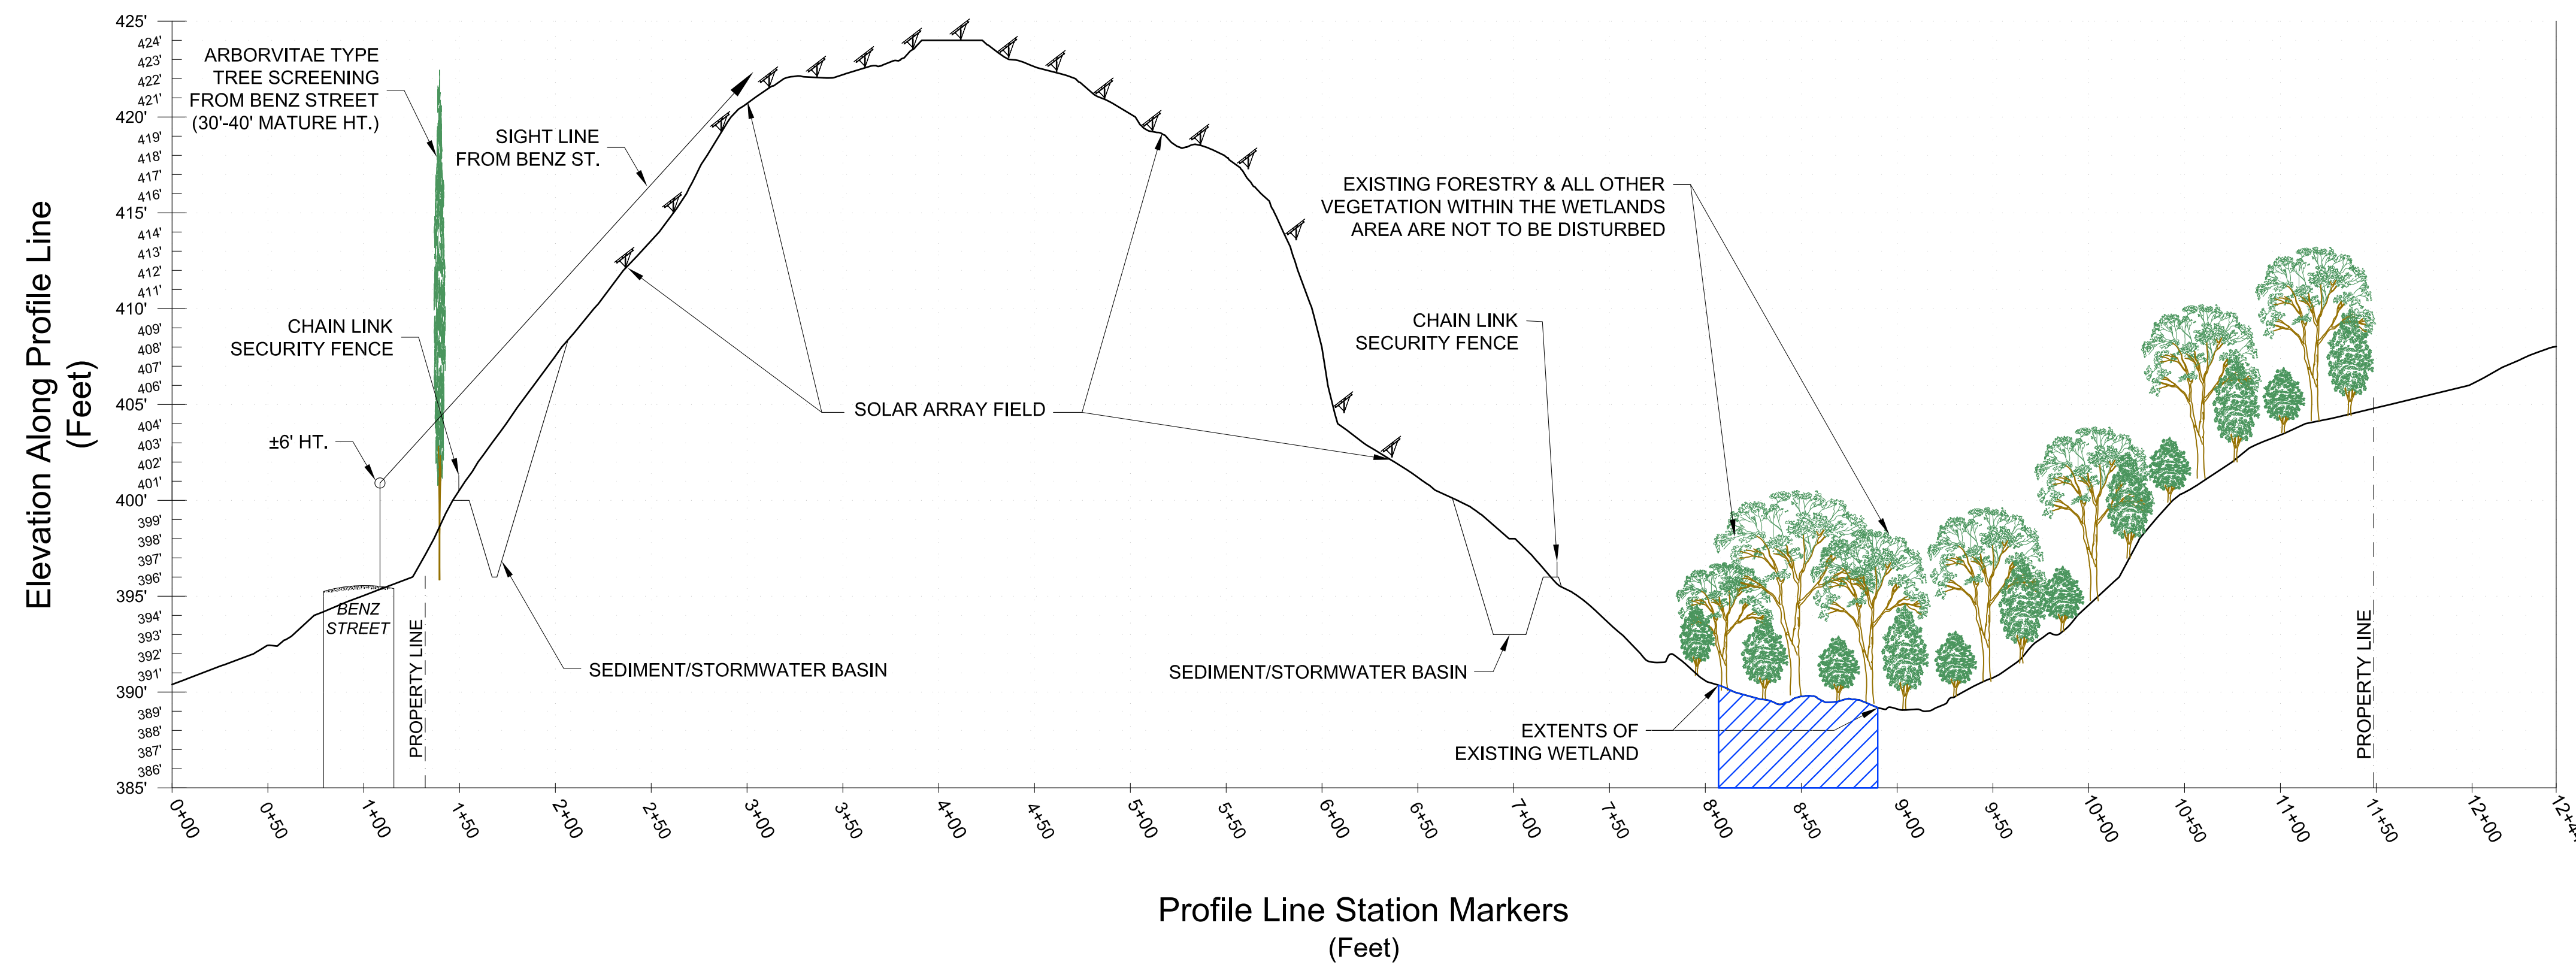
EXHIBIT B: PROJECT CROSS SECTION (SOUTHERN SITE VIEW)
